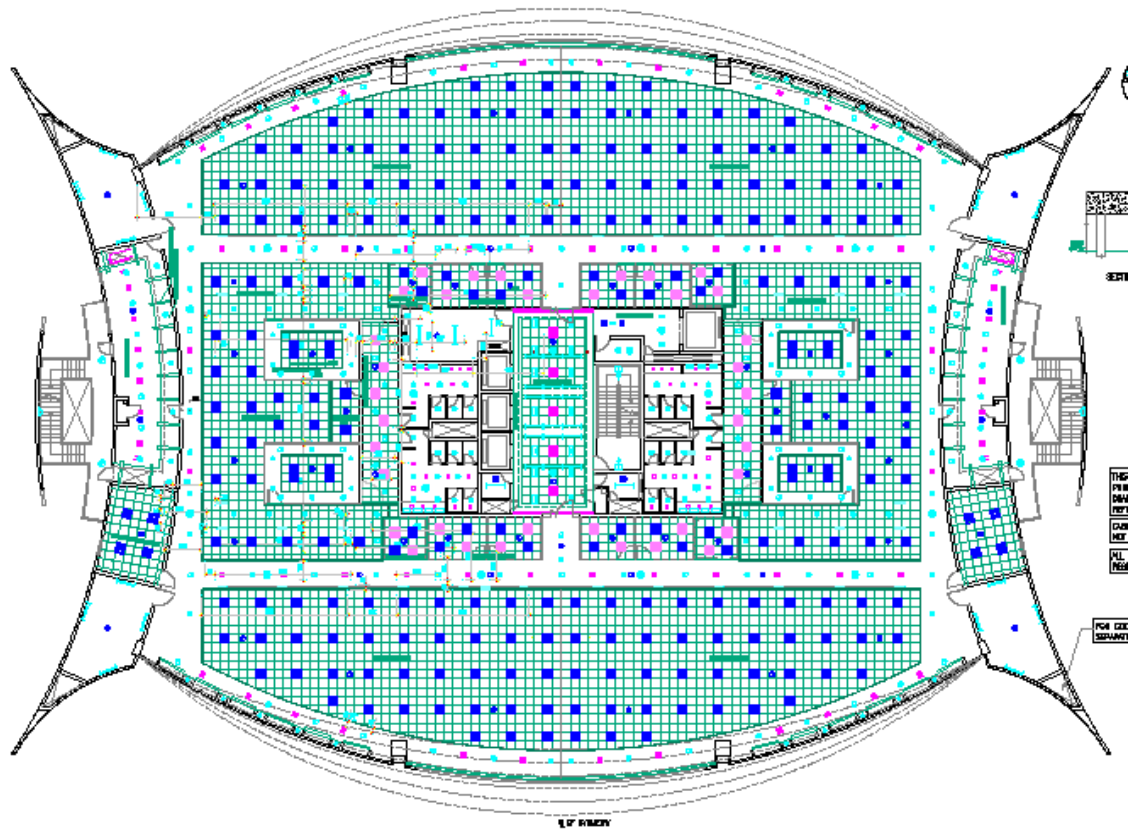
False ceiling Plan of typical office floor, INFOTECH Building
